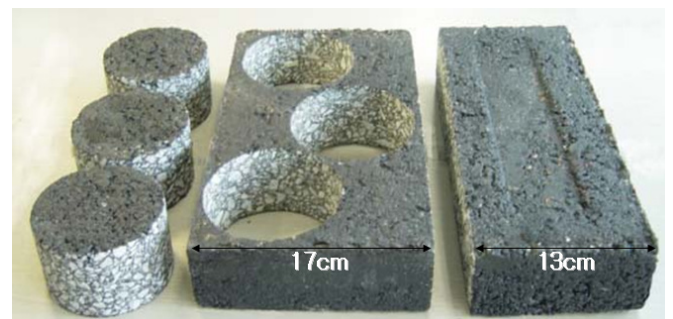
A slab specimens cut into one pieces for wheel tracking test and three core for Kim-test
